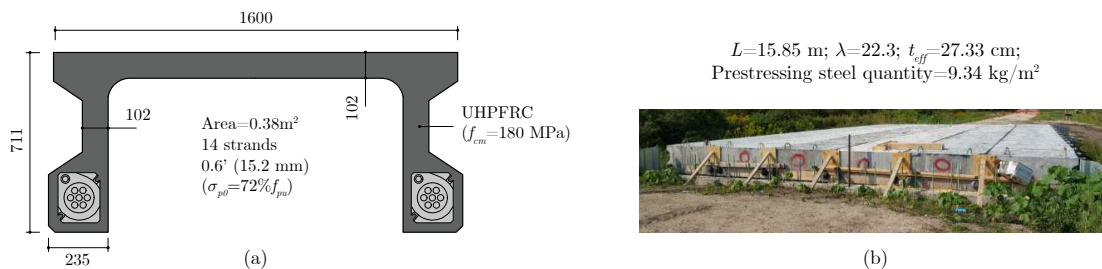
Hawkeye Bridge: (a) cross-section of the pi-girder design from the KITC, and (b) image of the six girders joint together. Adapted from [18].
